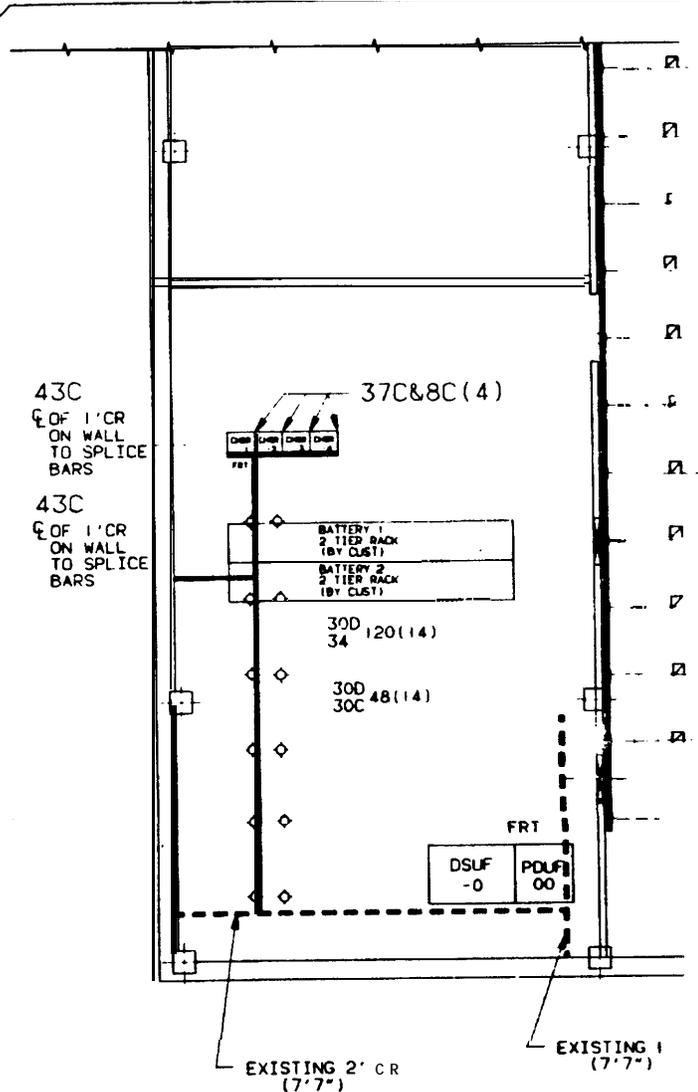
Example of GTD-5 EAX Power Room Floor Plan.
